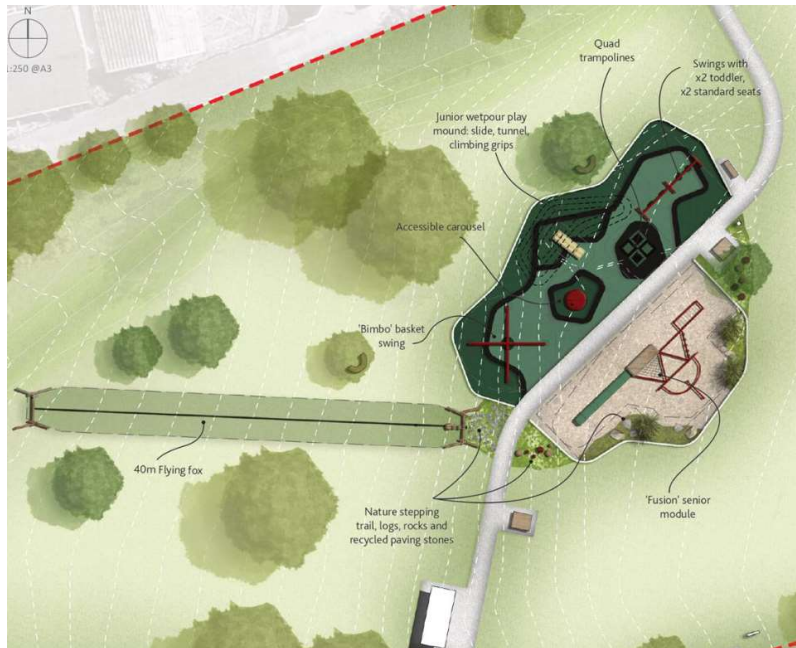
Anderson Park Playground Proposed Upgrade Concept Plan. Source: Manurewa Local Board Meeting Minutes 15 September 2022
